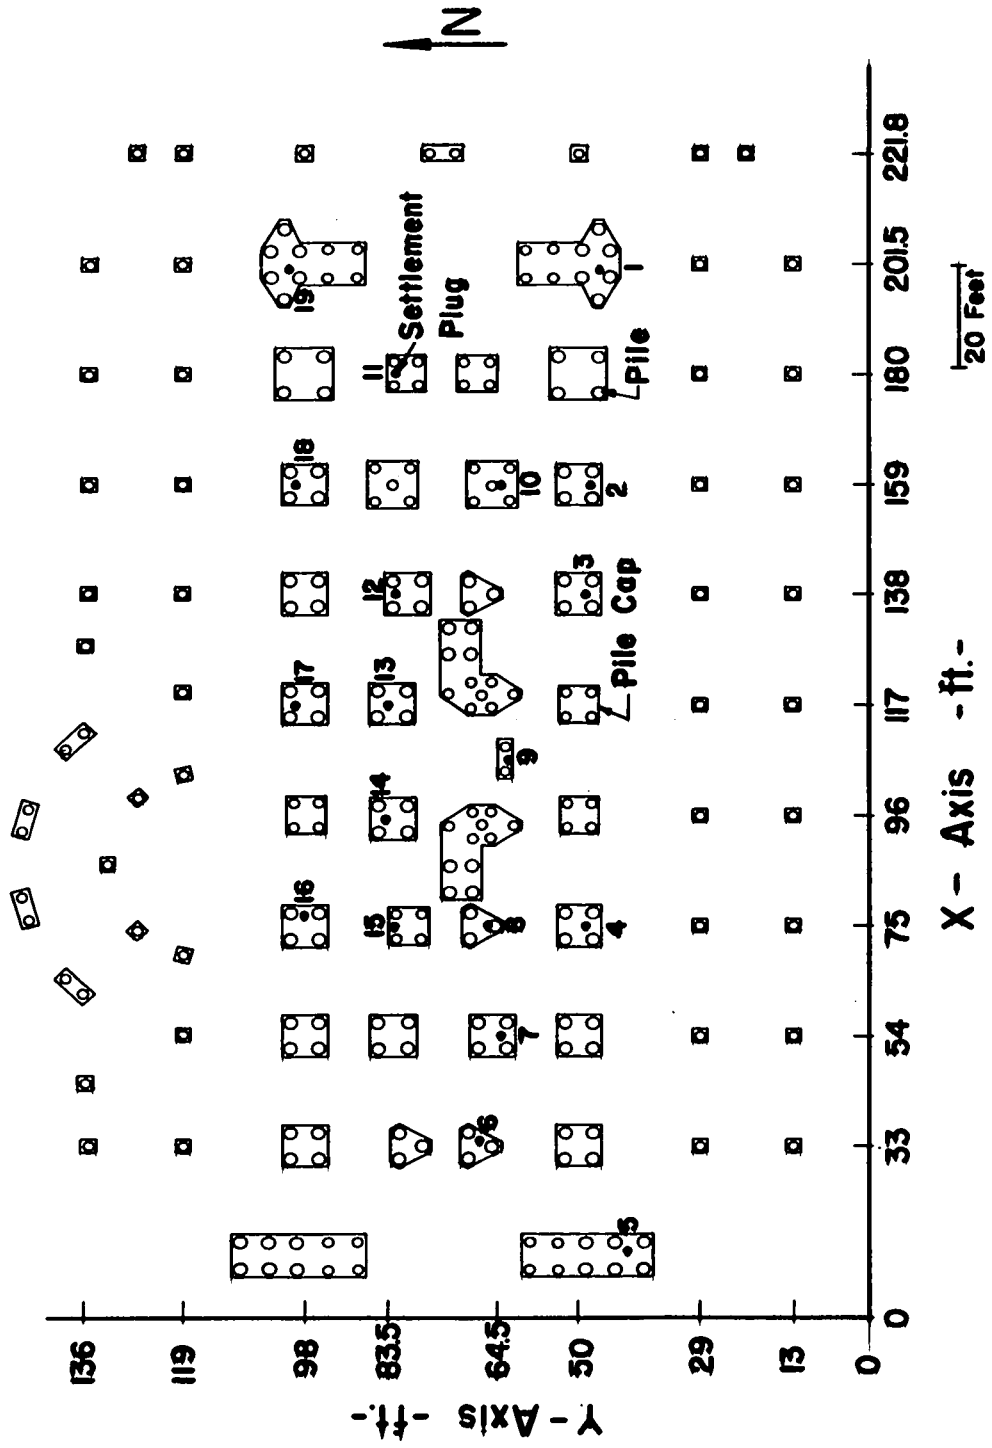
Foundation Plan and Settlement Plug Locations
